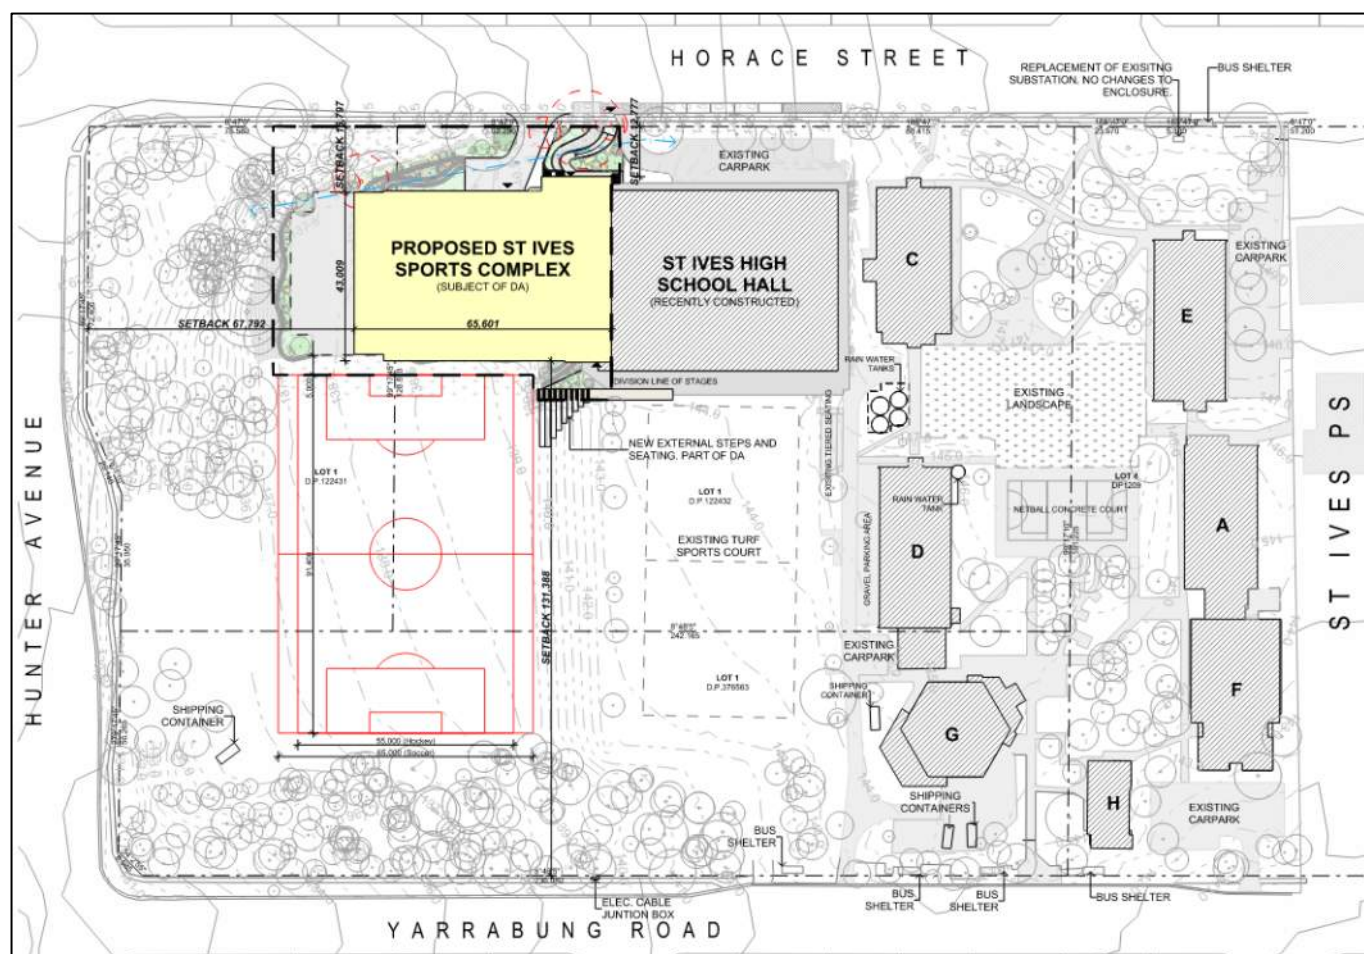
Proposed site plan (St Ives Indoor Sports Complex, dated 8 April 2021, JDH Architects)
